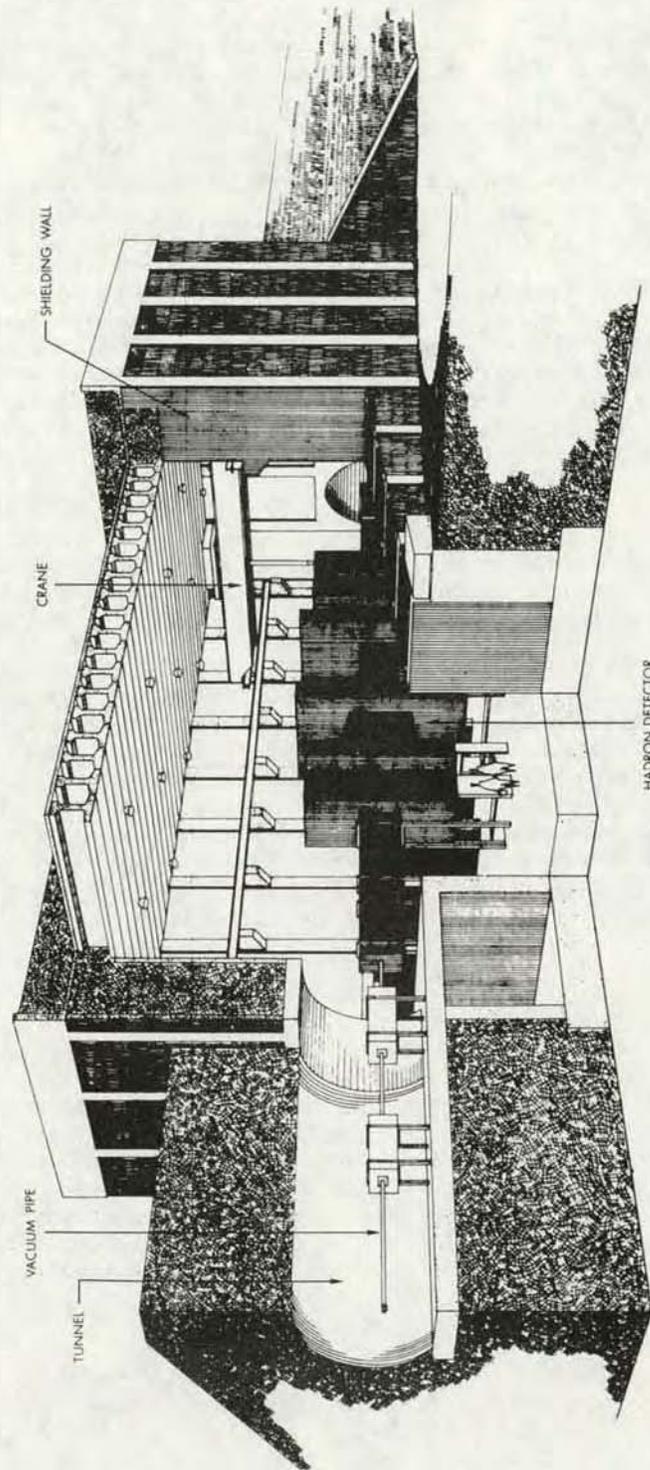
A TYPICAL EXPERIMENTAL HALL.
